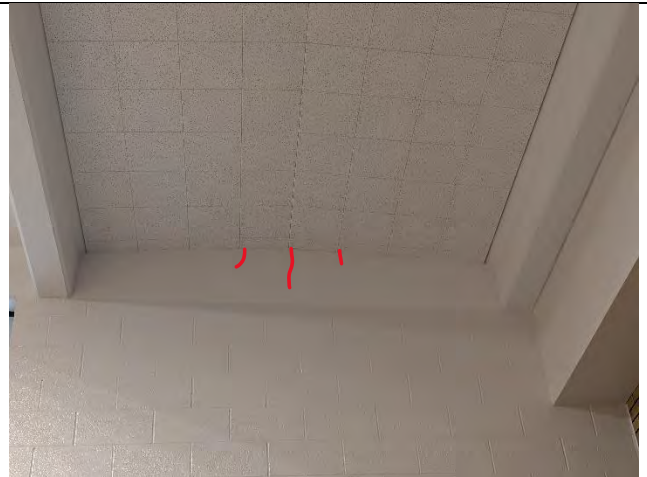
Concrete beam cracking over south gym wall (1/30/2026).
